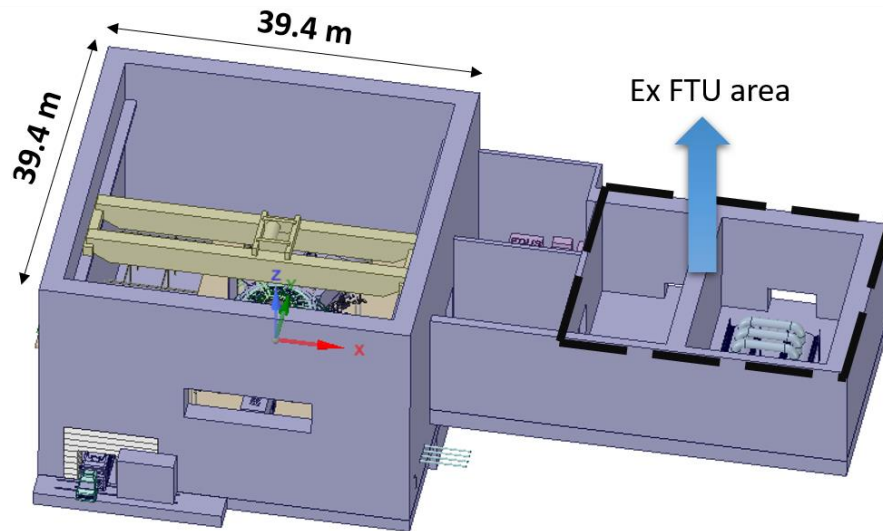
3D CAD view of the actual configuration of DTT THB with dimensions
